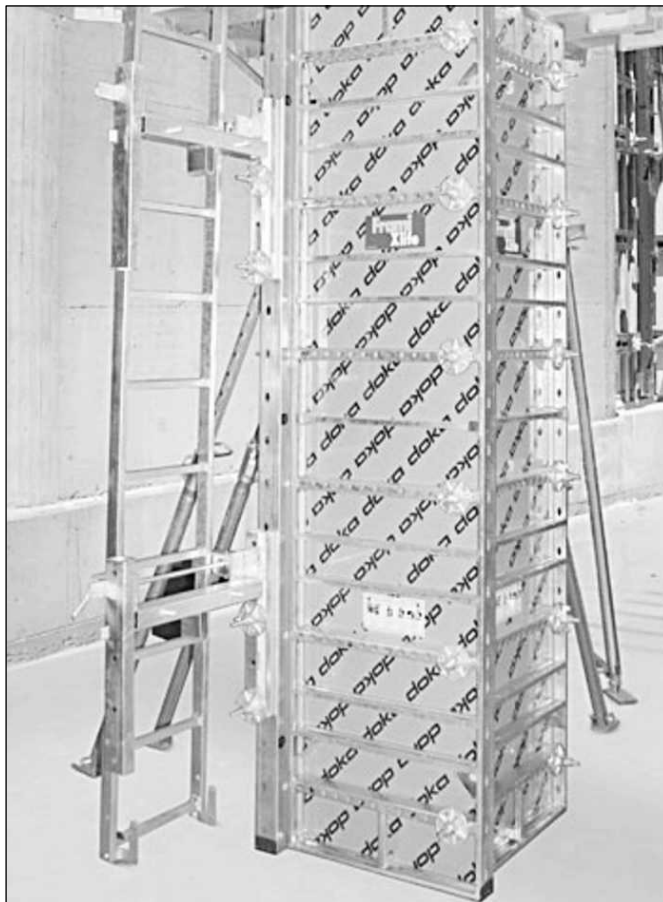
A Typical Column Formwork Frami Xlife (Courtesy Doka).
